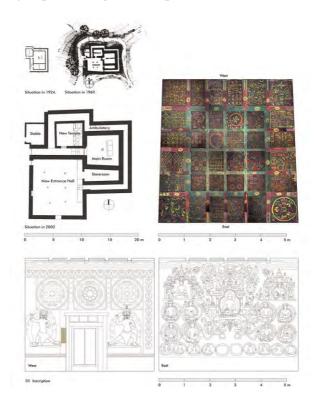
Ground plan, photomontage of the ceiling, and scaled drawings of the Western and Eastern wall in the main room of Lhalung's Serkhang. TU Graz 2013.
